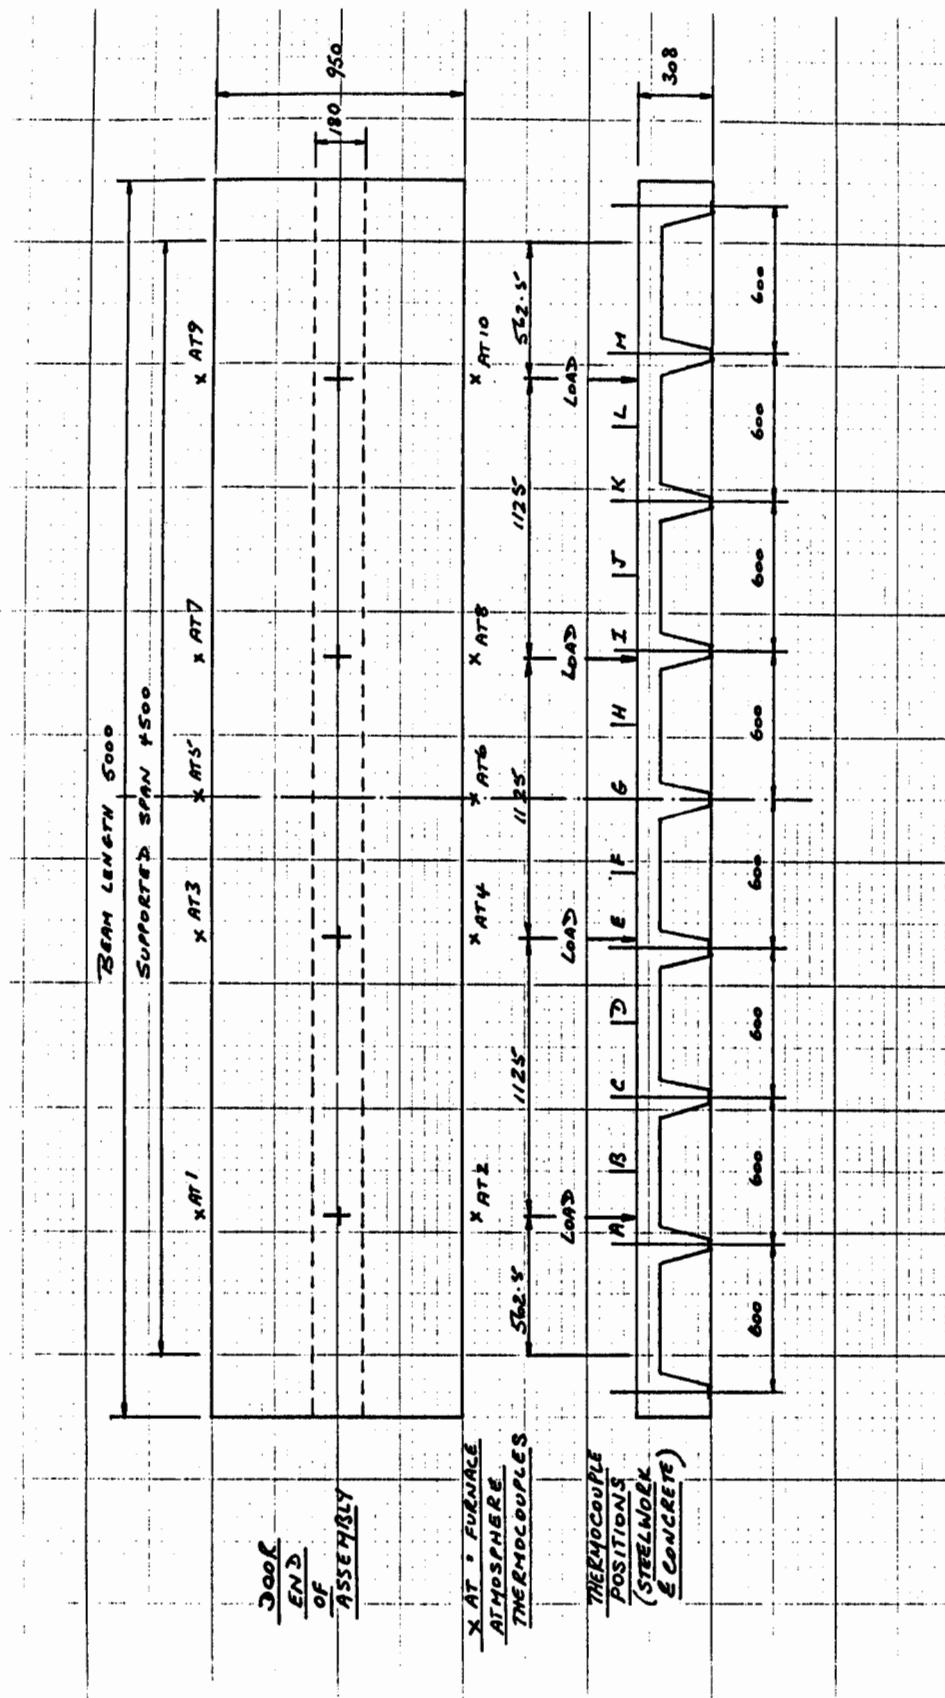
GENERAL ARRANGEMENT OF THE TEST ASSEMBLY
